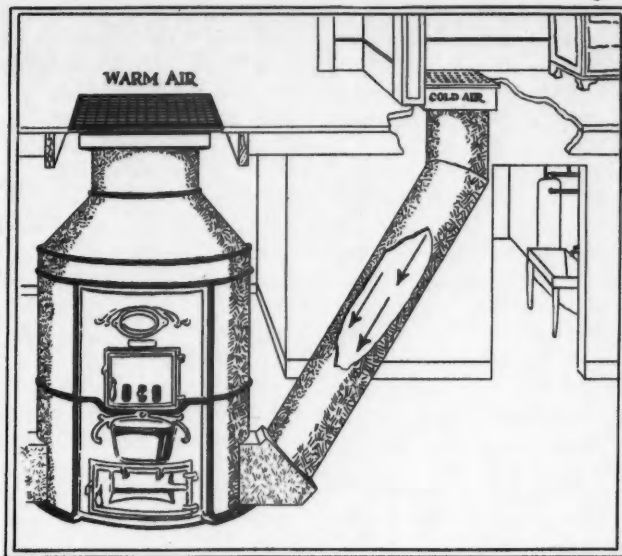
How Heating with a Pipeless Furnace Can Be Improved by Extending the Cold Air Duct to the Bottom of the Casing.
